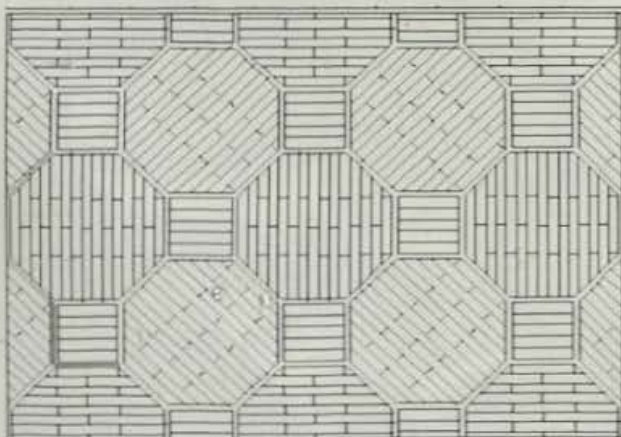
Lahore Fort, Lahore - cut and dressed flooring in geometrical pattern.
